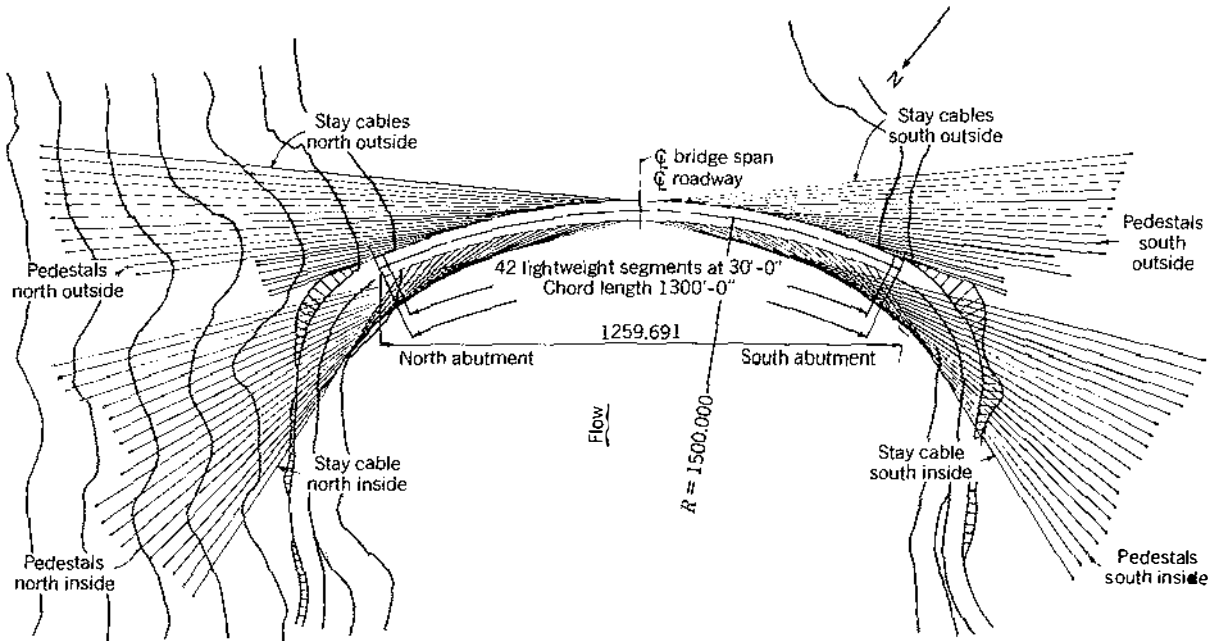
Ruck-A-Chucky Bridge, plan of bridge with concrete alternate, from reference 24
